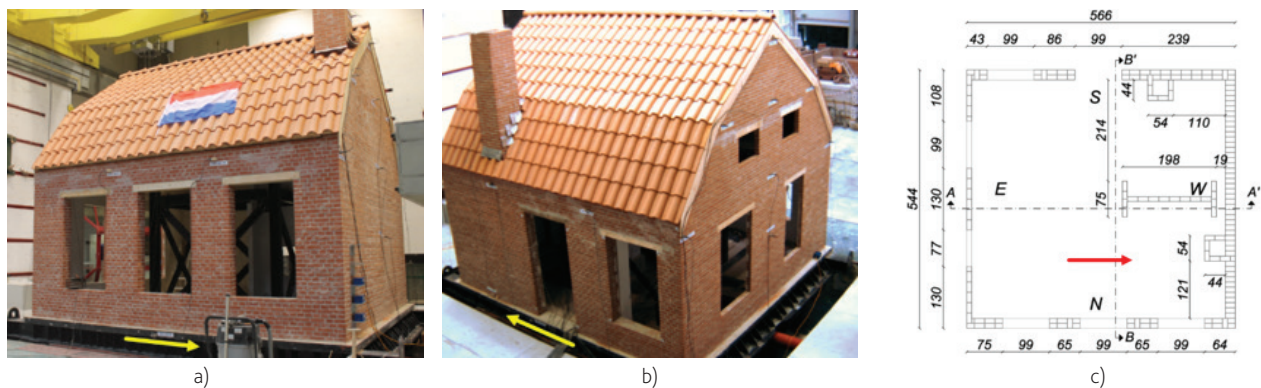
Full-scale specimen: a) North-West view; b) South-East view; c) ground-floor plan. Units of cm
